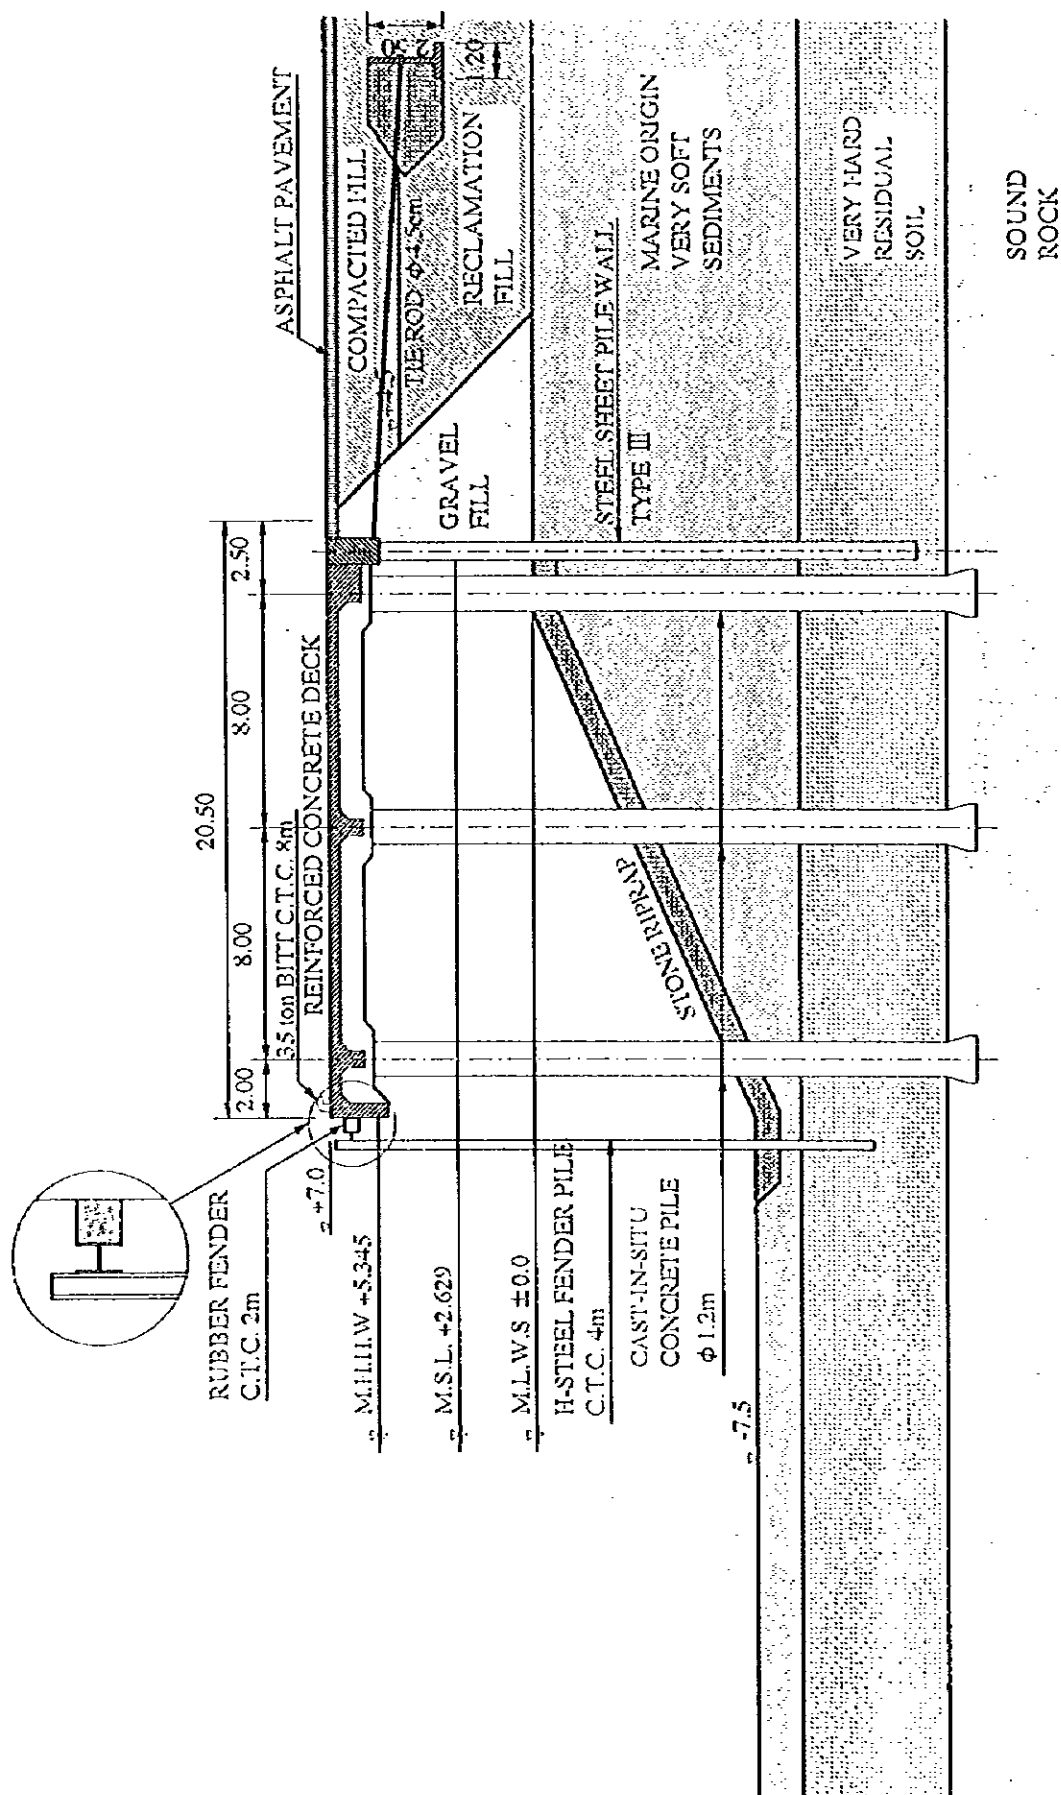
Recommended Cross Section of Tuna Boat Berths
